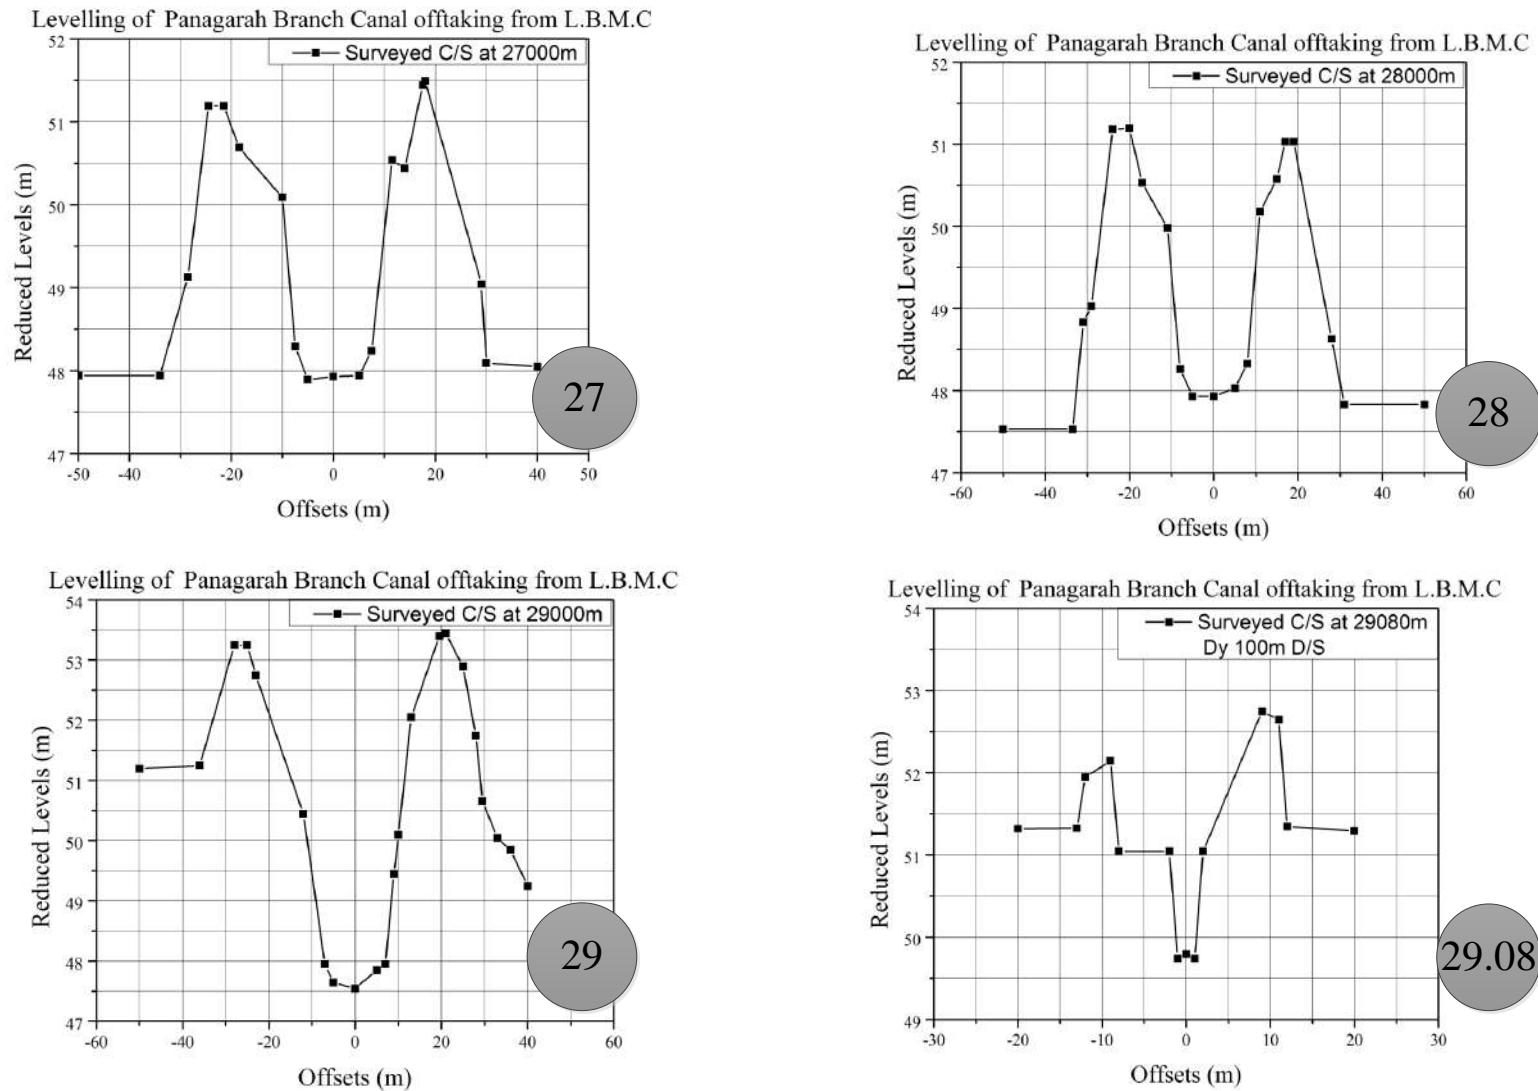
Canal cross section from 27 km to 29.08 km on Panagarah branch canal
